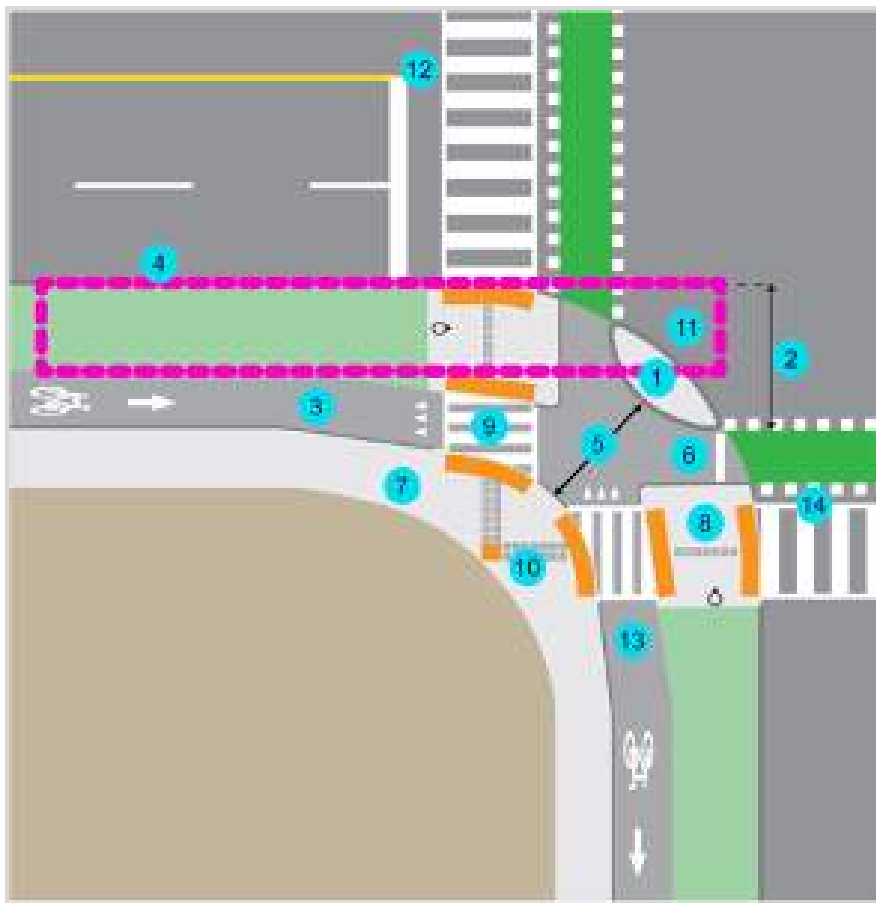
Protected Intersection Elements (adapted from City of Ottawa Protected Intersection Design Guide)
